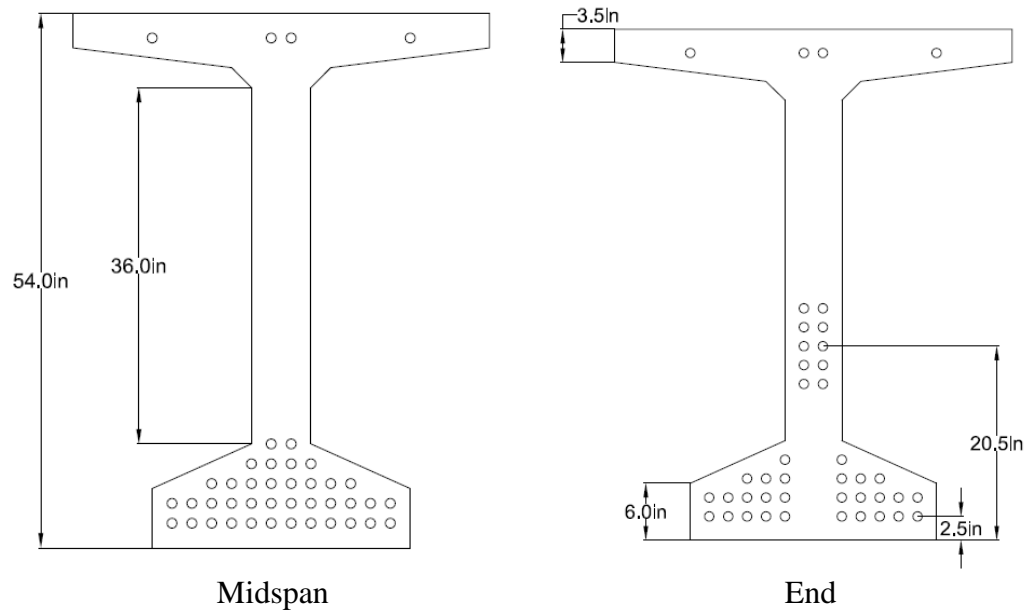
Strand layouts at midspan and end for AASHTO BT-54 girders
